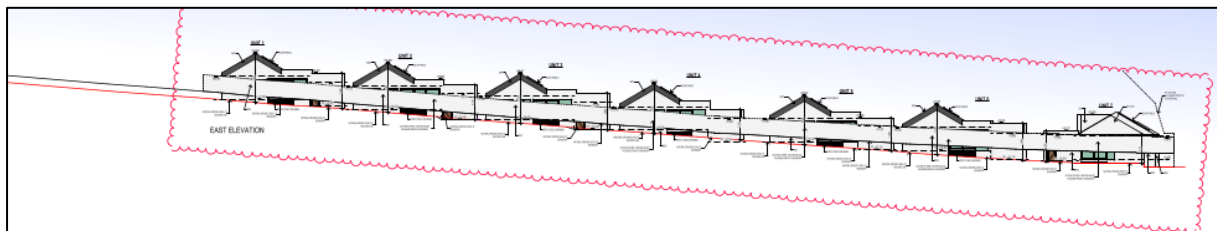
Proposed east site elevation showing the extent of building form presenting to the pipeline track. Source: Application document.
